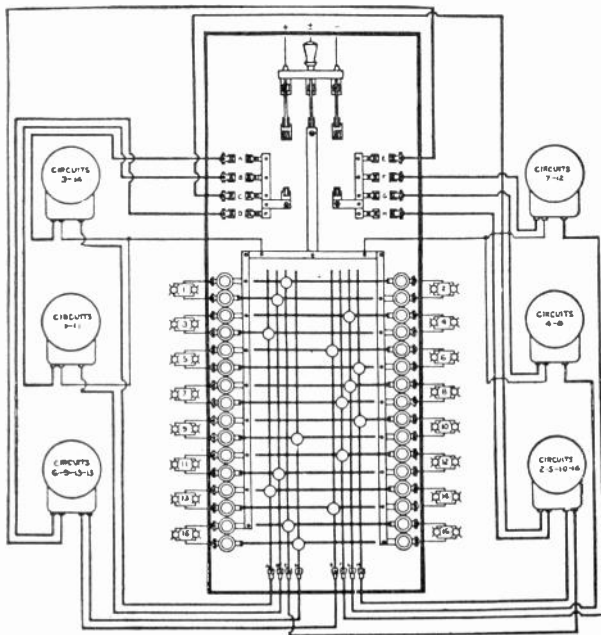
Wiring diagram for modern fuse and meter cabinet.
